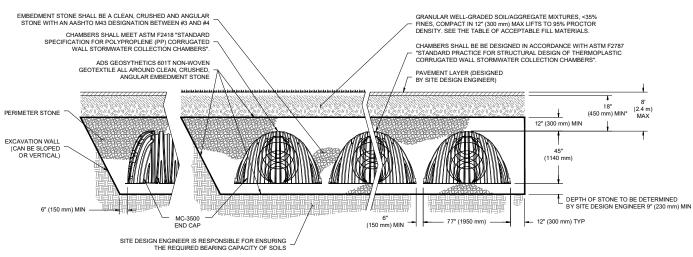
A - MC-3500 Structural Cross Section Detail (Not to Scale)
